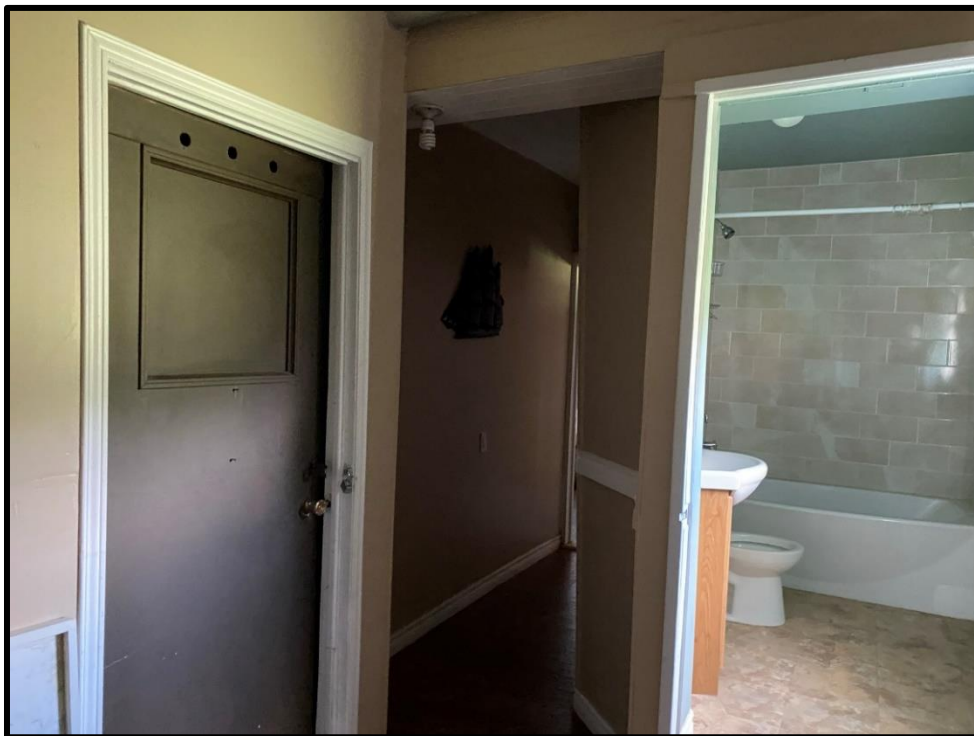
First Floor Hallway – Timber Cased in Wood Planking Visible at Centre
